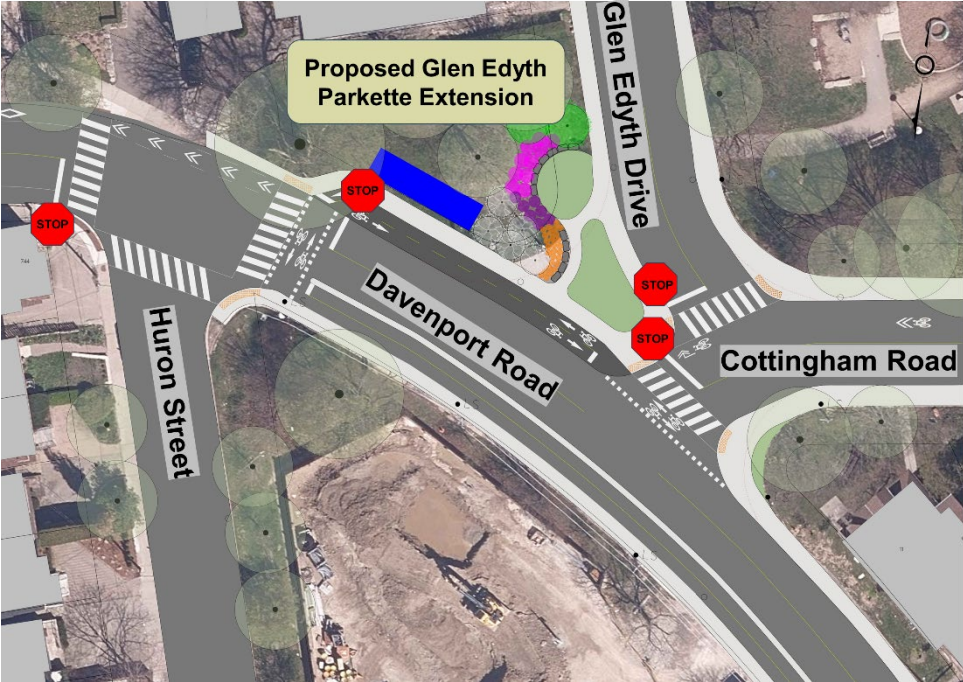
Proposed intersection safety improvements at Davenport Road and Glen Edyth Road and Cottingham Road.
